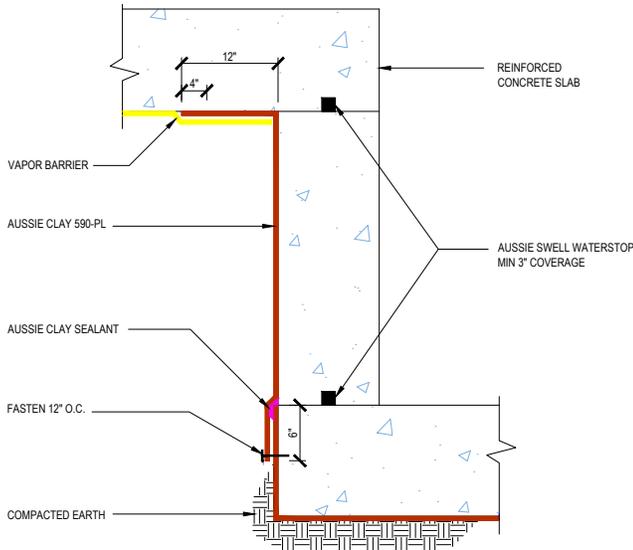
ELEVATOR PIT FLUSH SLAB W/ VAPOR BARRIER
